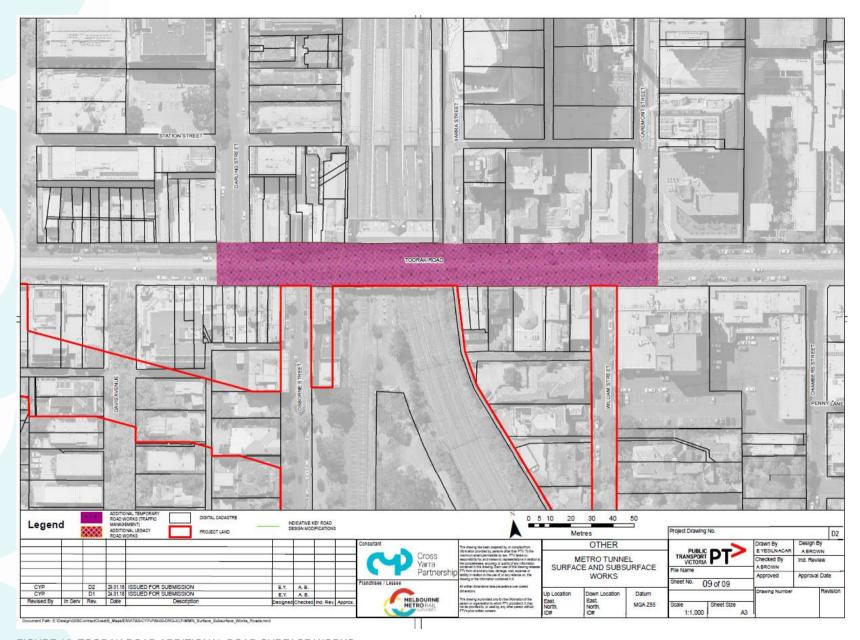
TOORAK ROAD ADDITIONAL ROAD SURFACE WORKS
